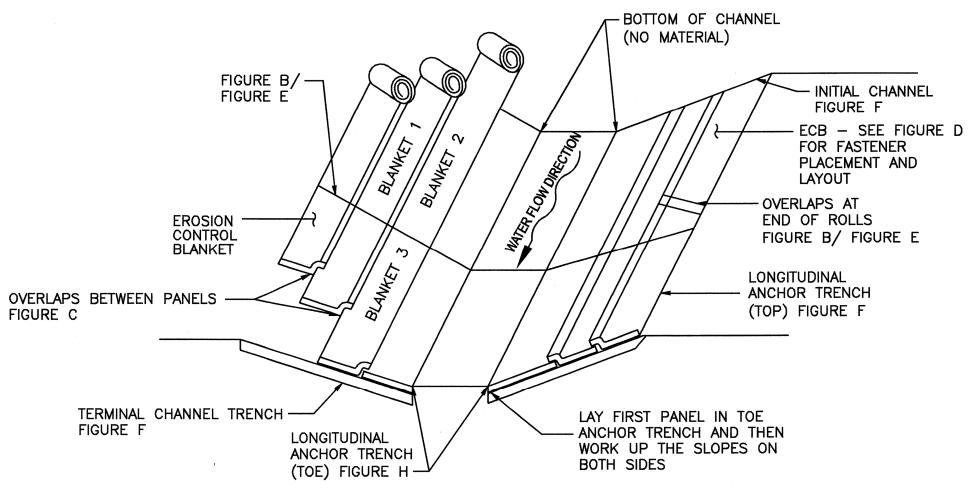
FIGURE A - EROSION CONTROL BLANKET (ECB) - GENERAL LAYOUT
